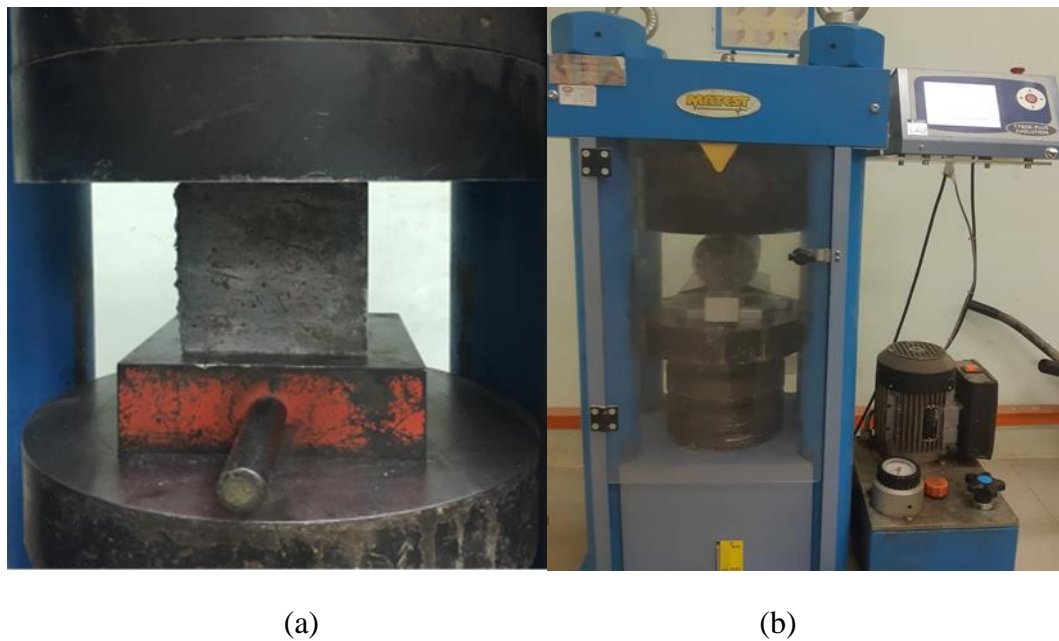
a) Cube specimen compression test b) Cube test machine
